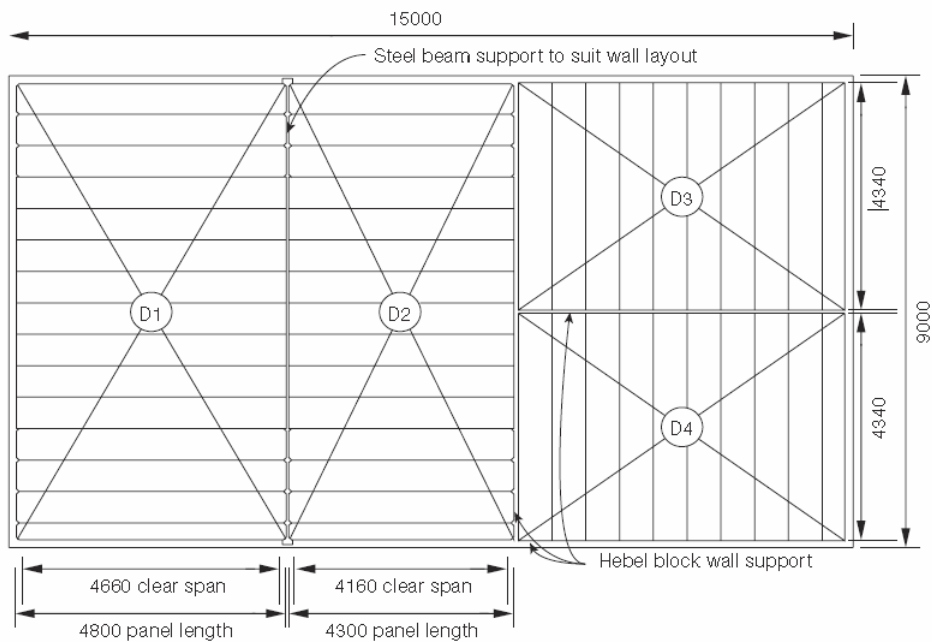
Layout Arrangement of Hebel® Supercrete Flooring
